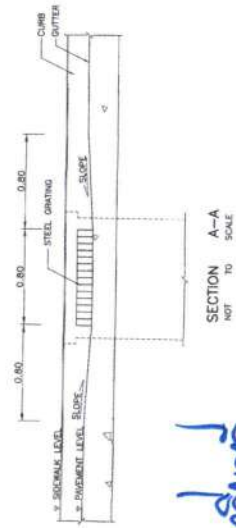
DETAIL OF CURB AND GUTTER OR CURB AT RAISED MEDIAN
